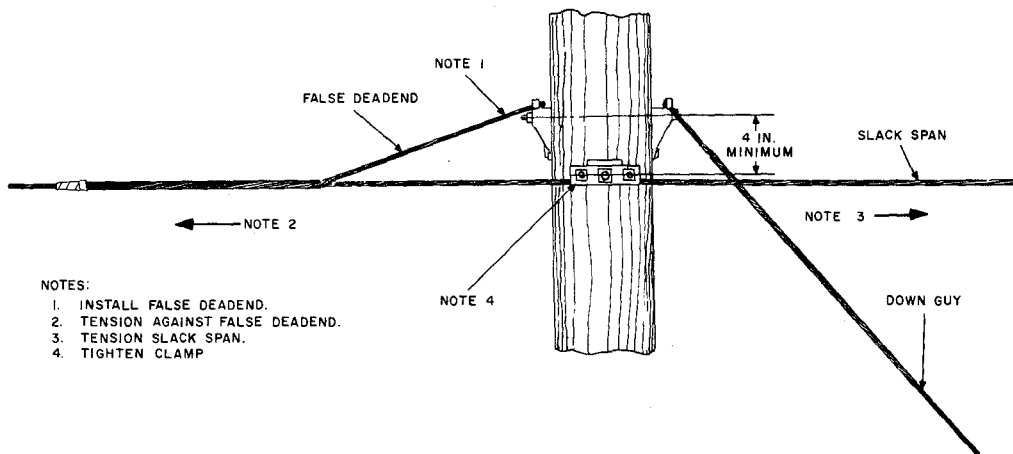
Pole-to-Pole Guys Installed for Slack Span Construction
